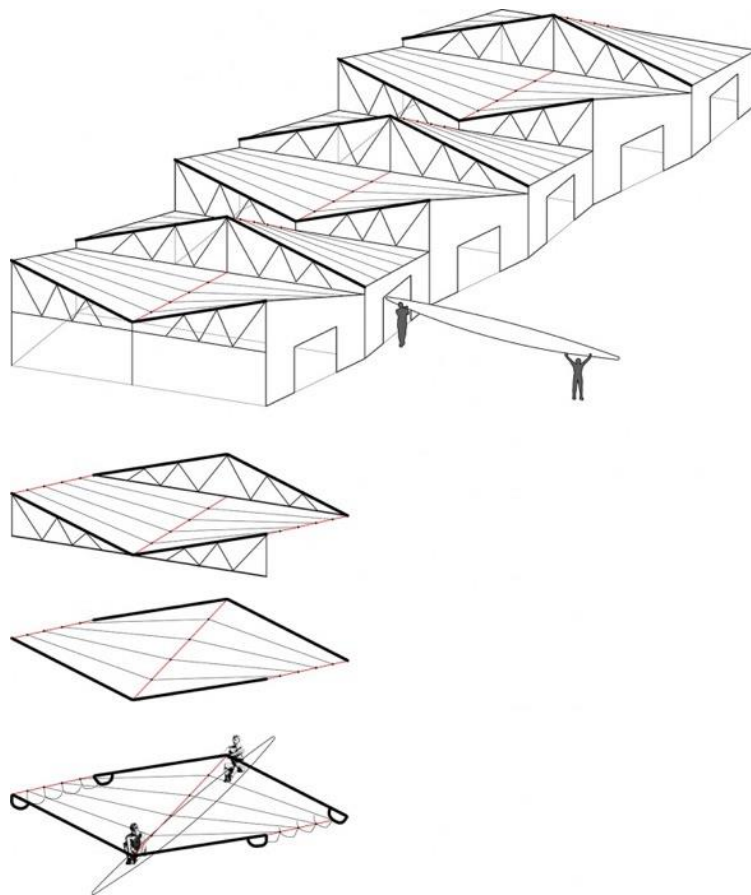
WMS Boathouse Roof Diagram, source: © Studio Gang
